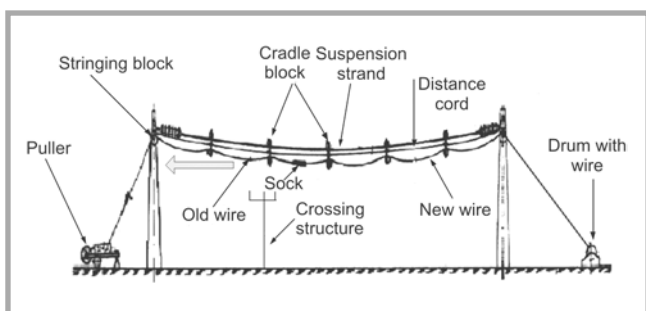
Old wire replacement on energized crossing lines (J. Macetko)
